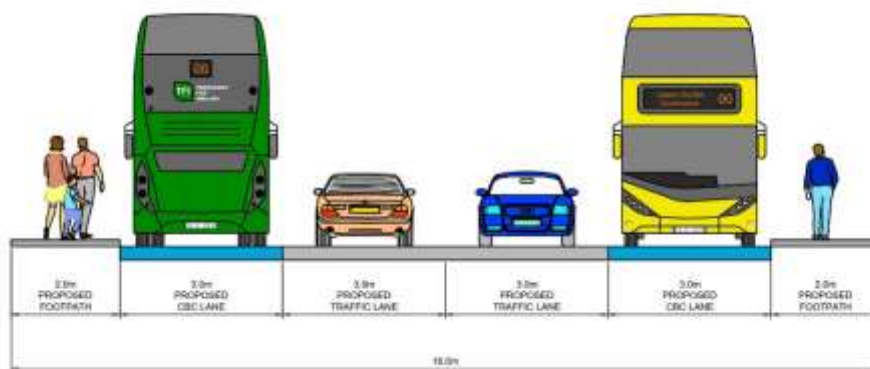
Typical Cross Section without Cycle Facilities (A - A)
